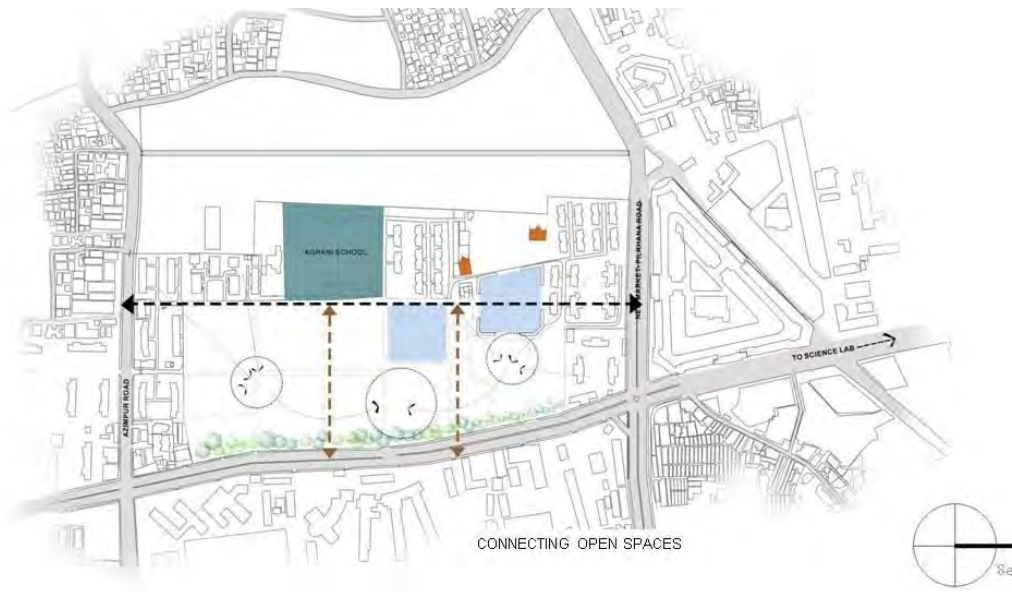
Connecting Open Spaces (Source: Author)
